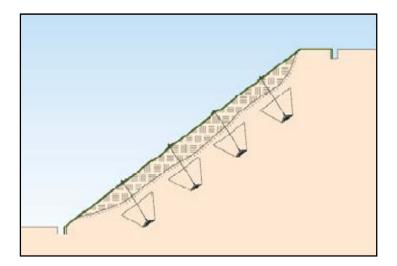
Installation of earth anchor (Source: Titi and Helwany, 2007)
